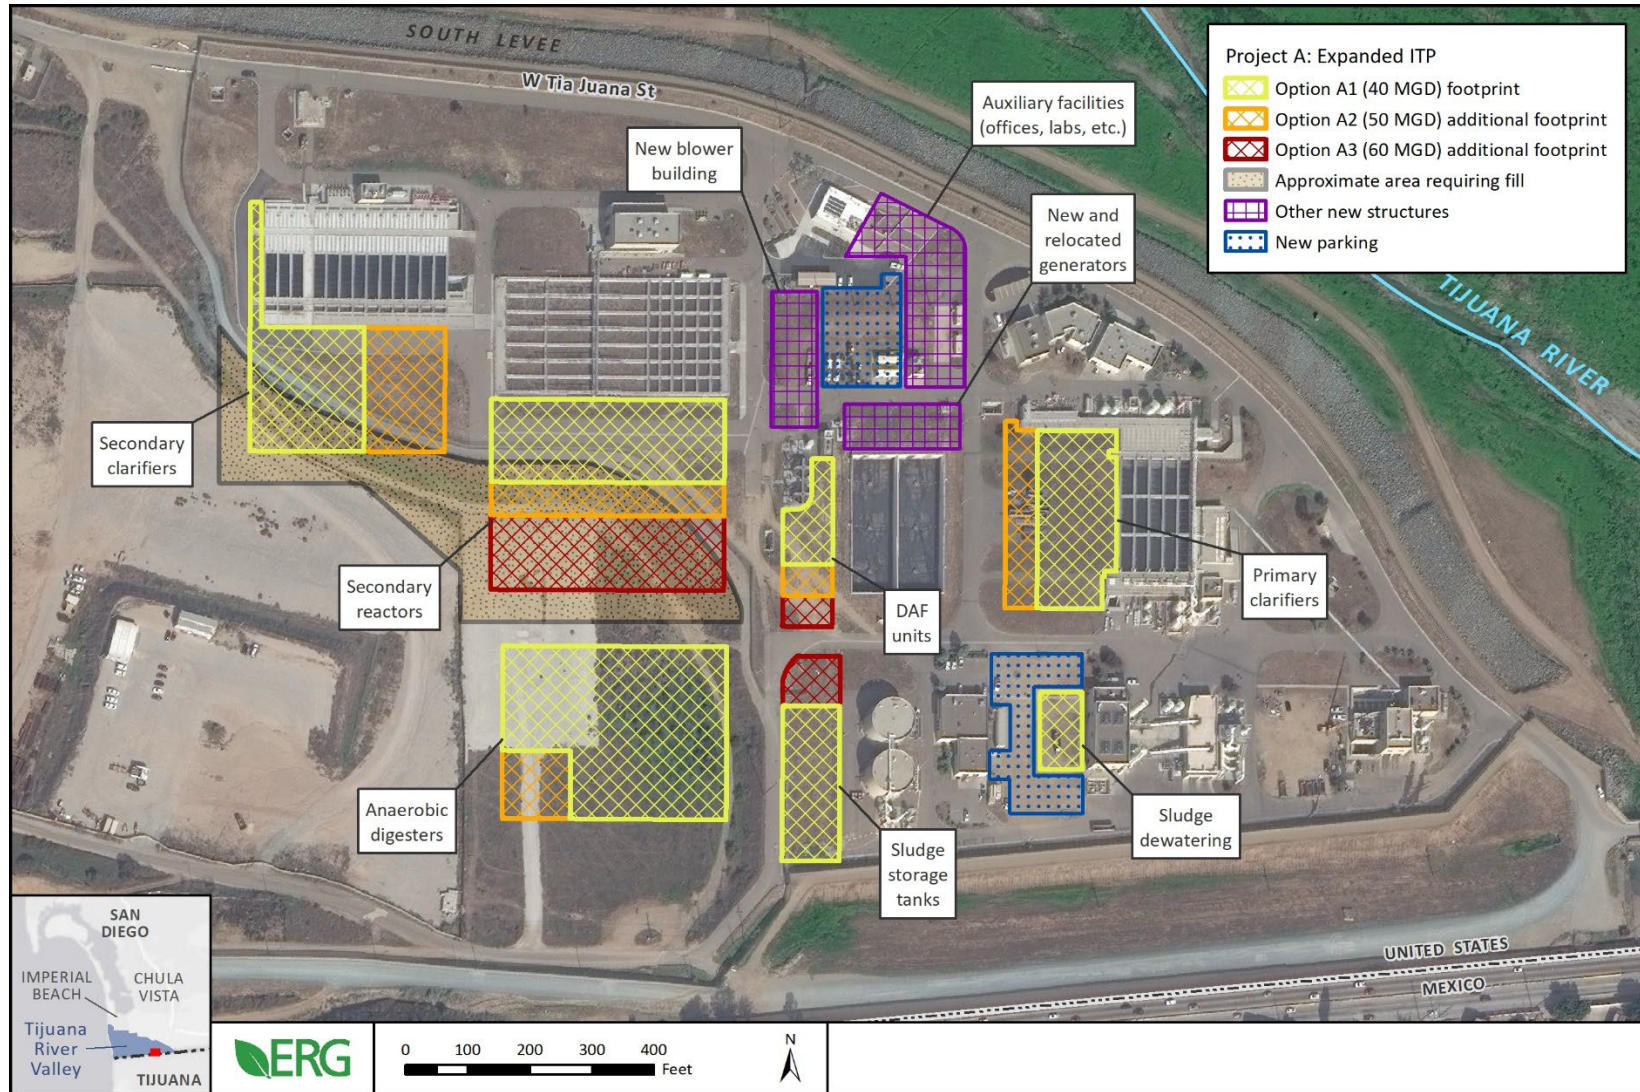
Project A (Expanded ITP) - Conceptual Site Plan of Proposed Facilities.
